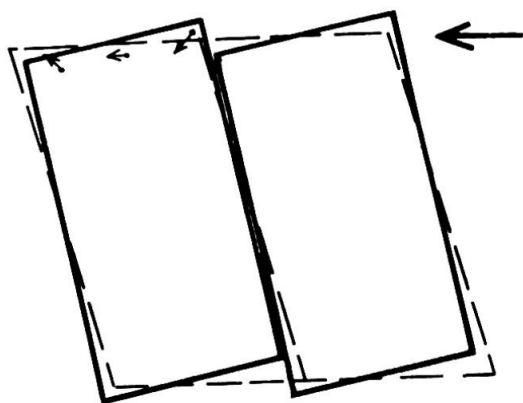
Wall element with two board panels loaded in shear. Schematic illustration of deformations. The small arrows show the deformation of the nails from board to timber frame.
